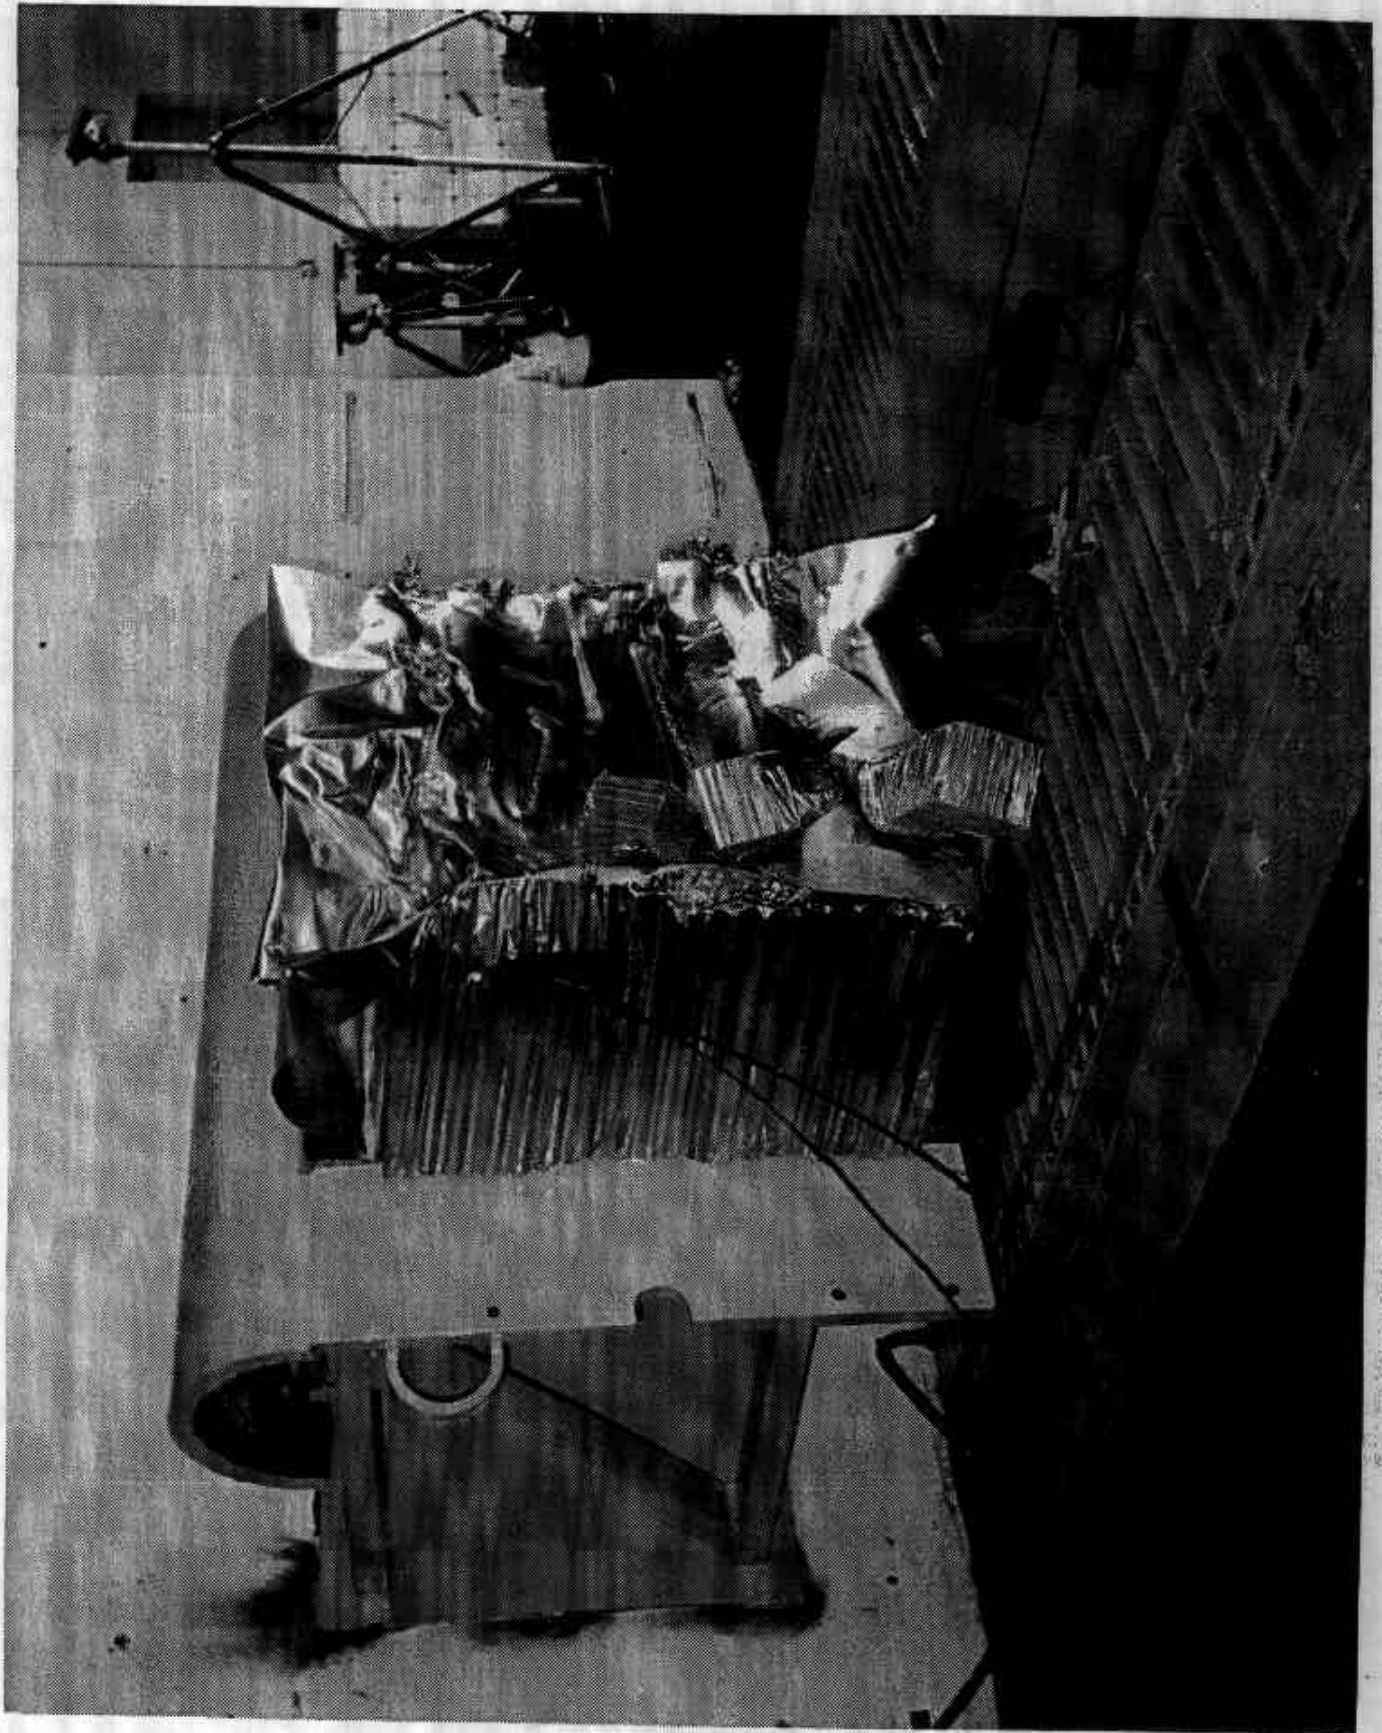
POST-TEST BARRIER RIGHT FRONT THREE QUARTER VIEW
